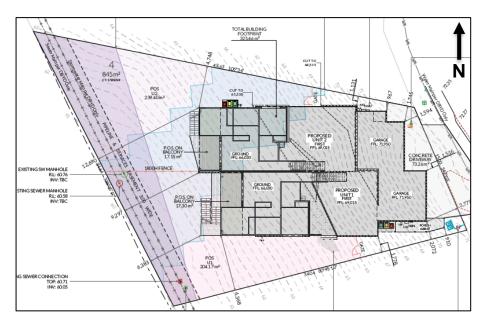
Part of Proposed Site Plan A.02 by Pinnacle with flood prone areas shown relative to proposed buildings
